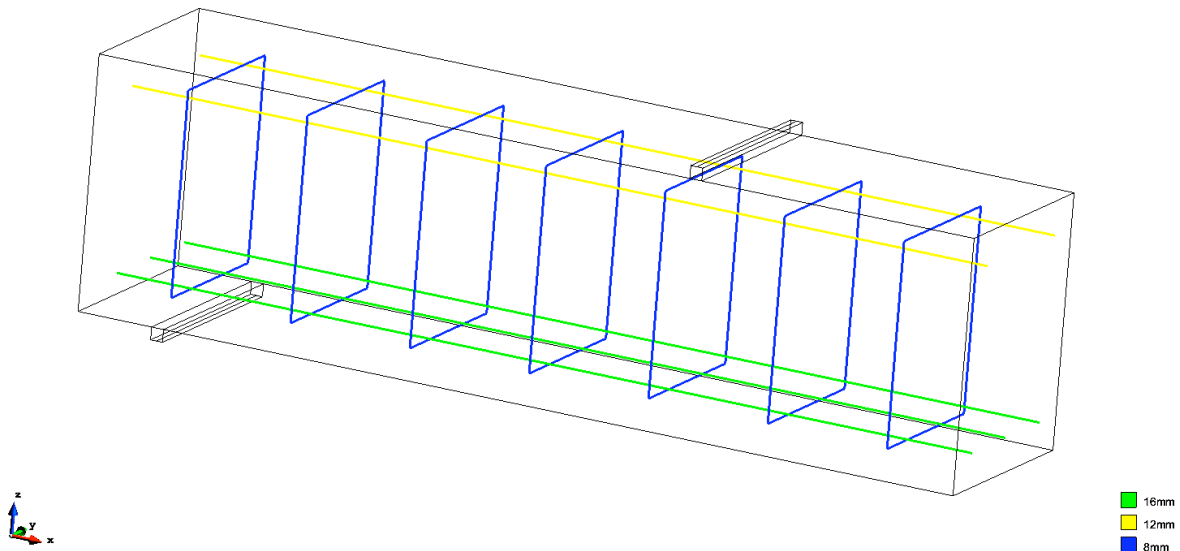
Constructed reinforcement in GiD with assigned materials
